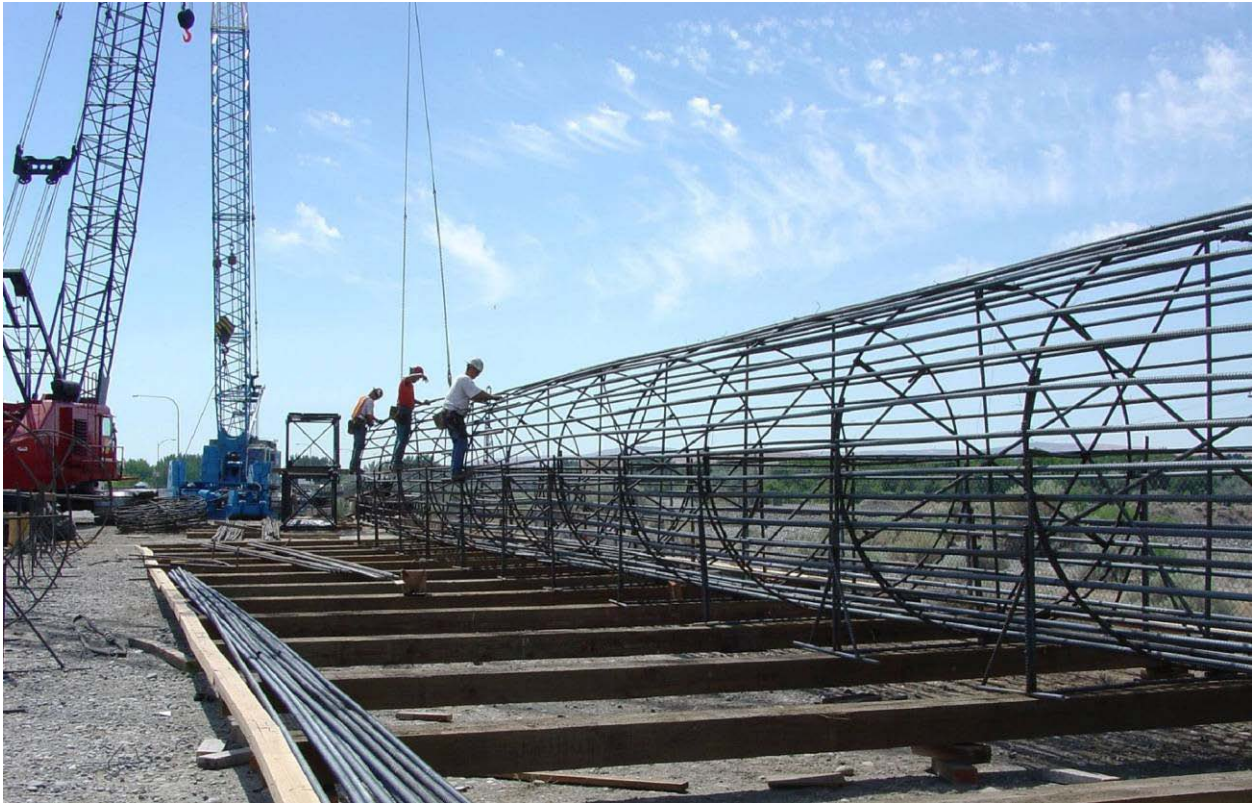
Preparation of a Steel Reinforcement Cage for a Drilled Shaft
